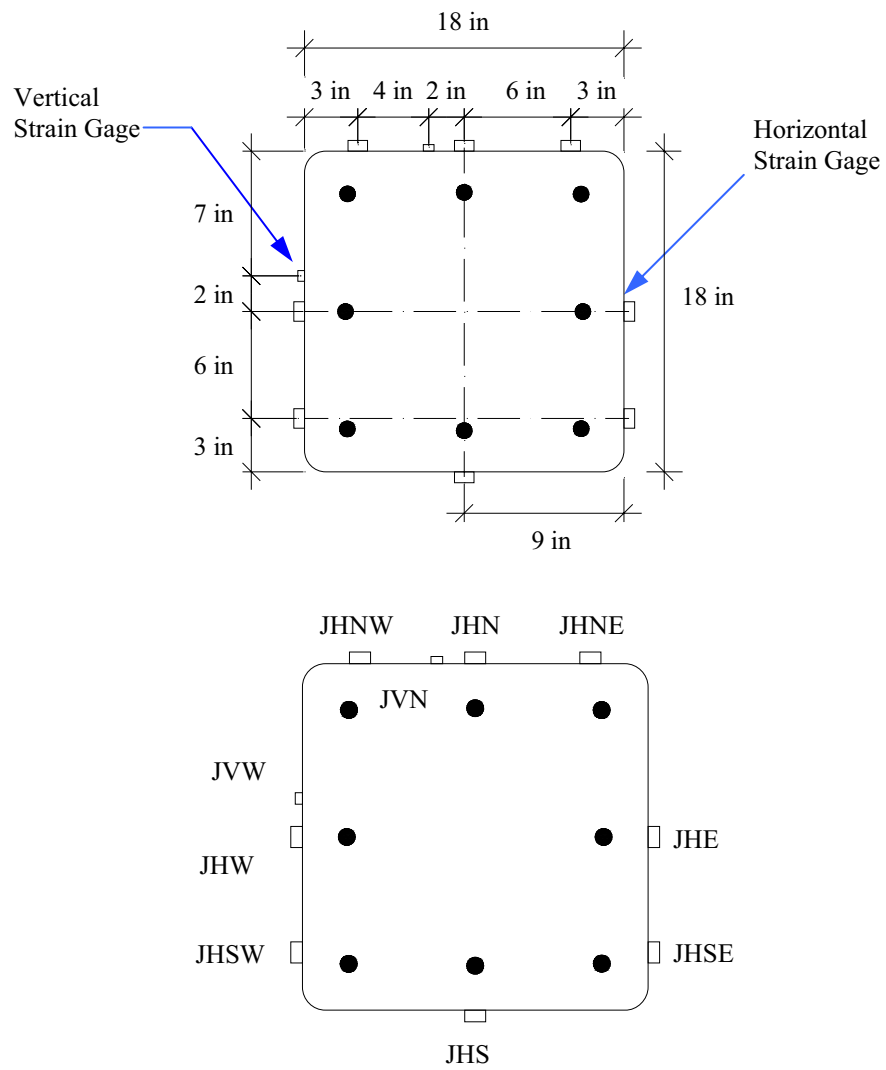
Section B-B; Strain Gages Location on FRP; Specimens C2 & C3
